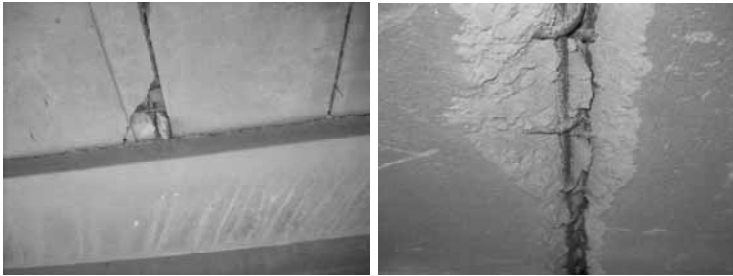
Fracture of pre-slab edges and visible pre-slab reinforcement, failed repair
